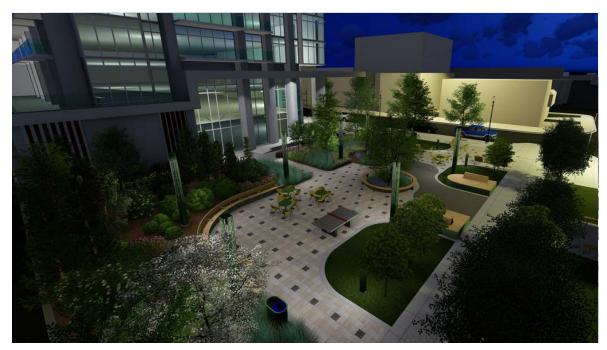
entrance at southwest corner of site illuminated by custom bollard lighting and street lighting
